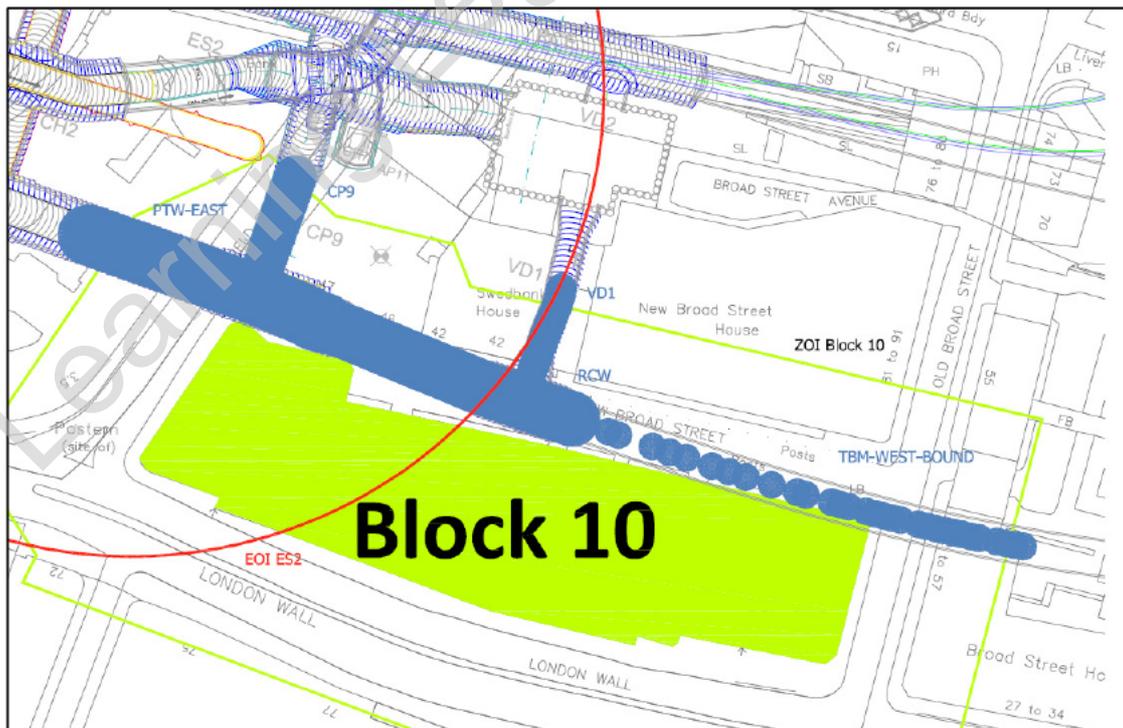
Block 10 Active ZOI Construction and Remaining EOI Construction Plan
